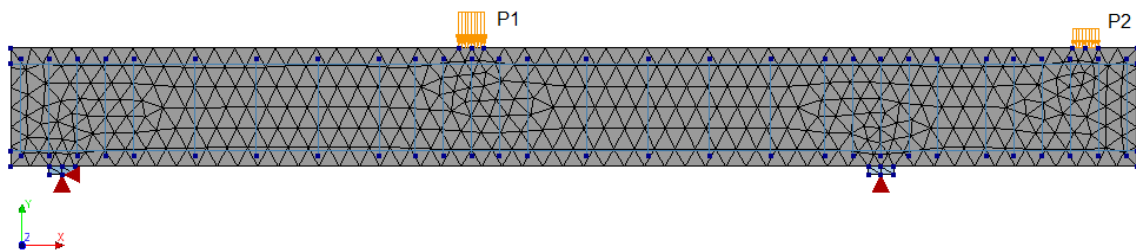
Discretisation, loading, supports and reinforcement layout of flexural beam in SLA
